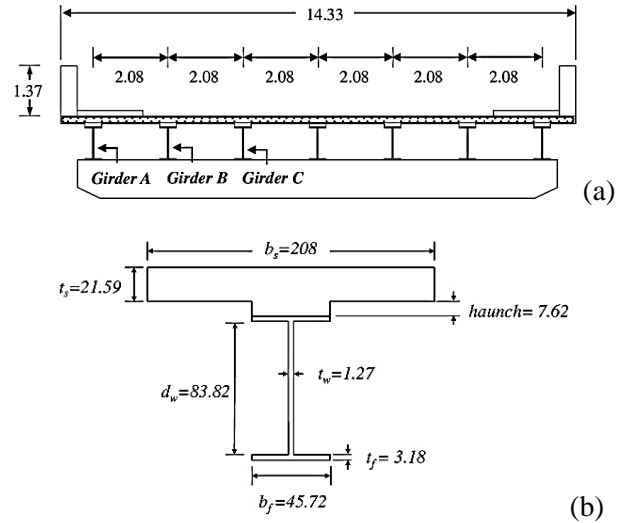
(a) Transverse section of superstructure of the bridge (dimensions in meters) and (b) Geometry of the girder section (dimensions in centimetres).
